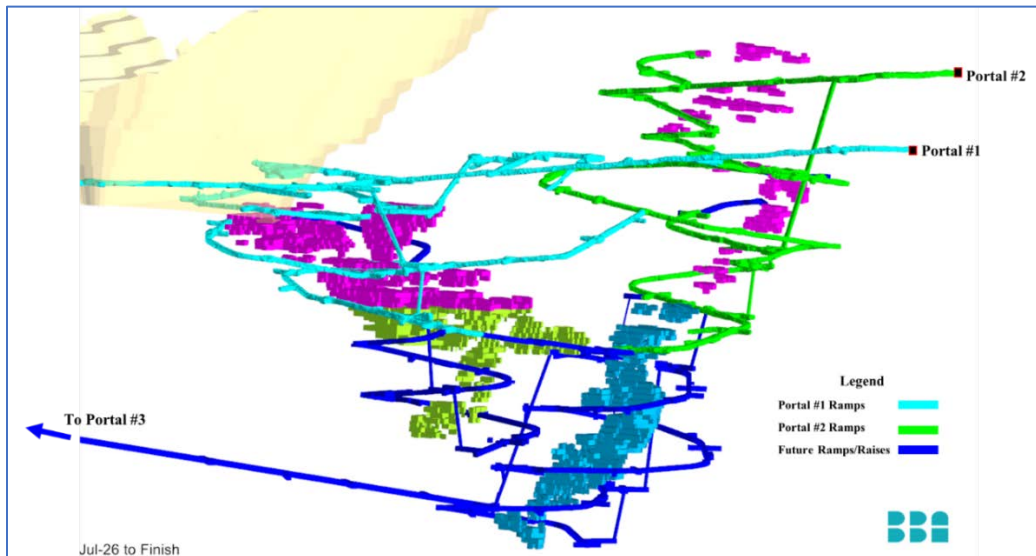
Underground Ramps Portal 1 and 2 Trucking Routes (figure not to scale)
